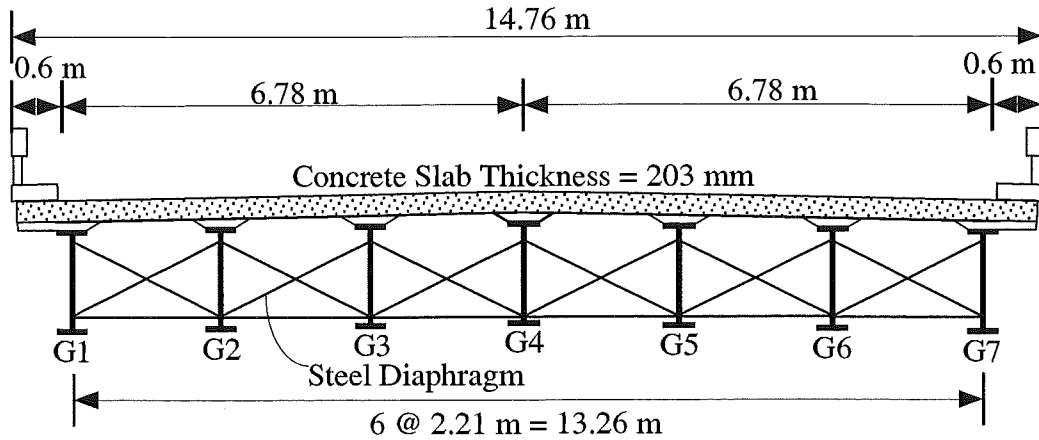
Cross-Section of the Bridge ST/I75 (S11-25032).
